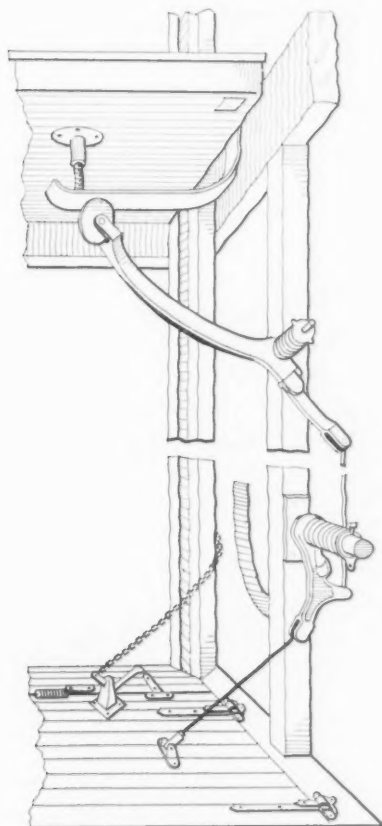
Automatic Hinge Door for Fast-Running Elevator.
